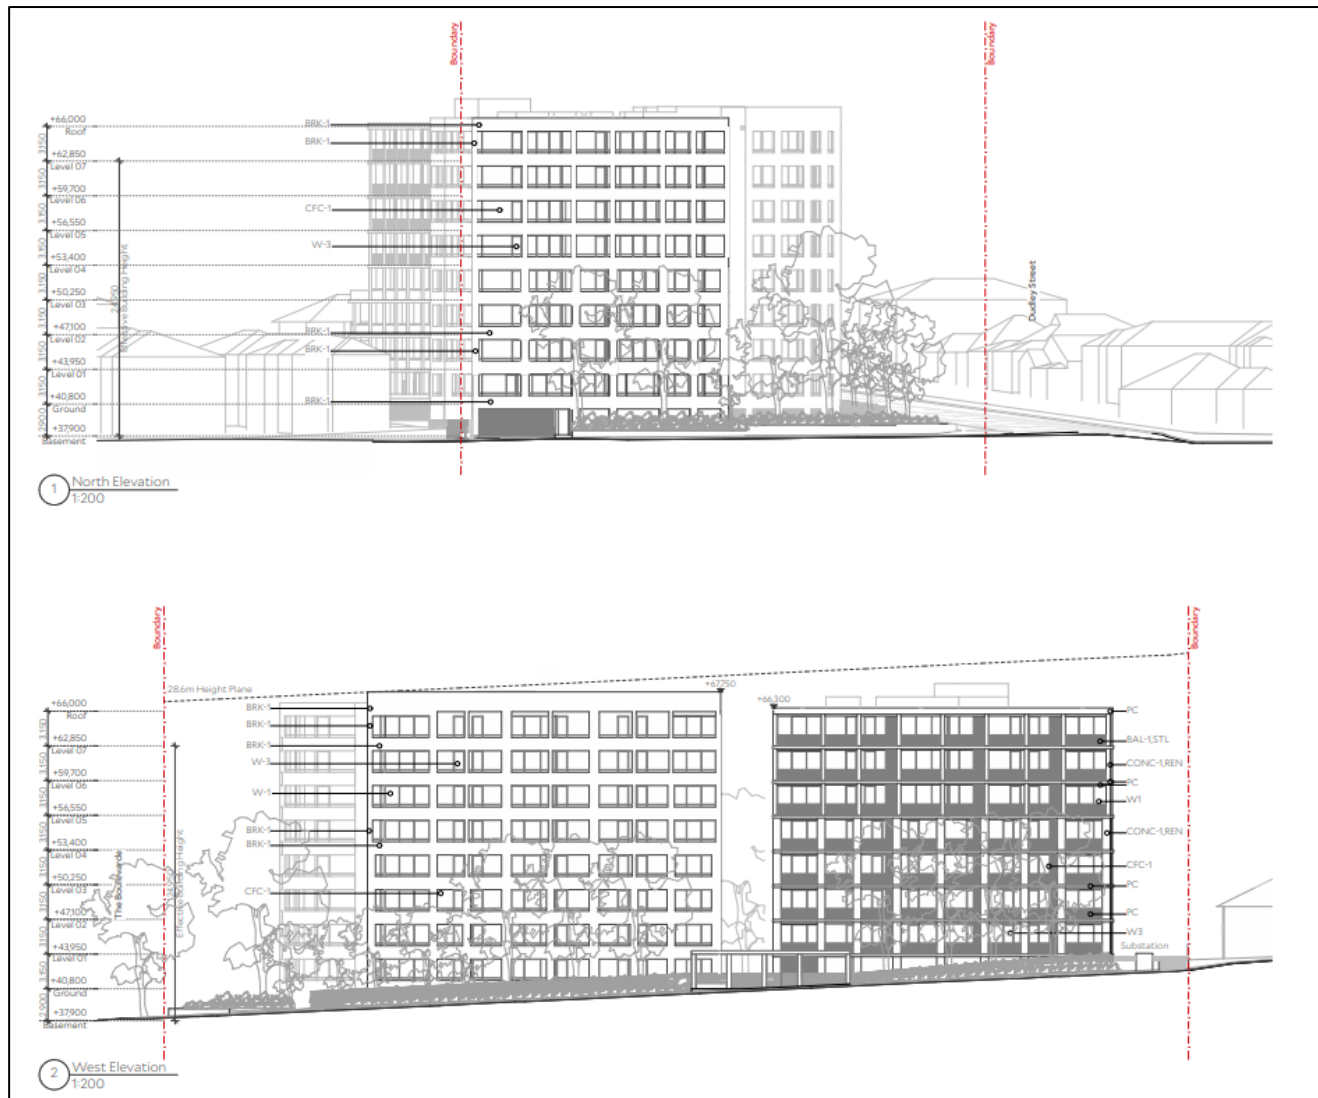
North and west elevations of the proposed development (Source: Collins and Turner, *Revision A 22/09/2025*)
